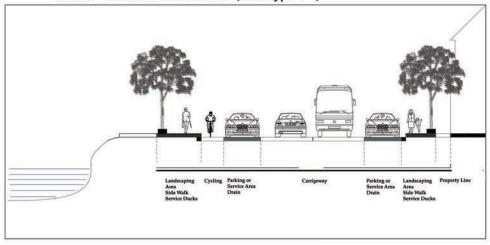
Cross section of a Level 01 – Functional Water Drive - (Road Type - 1–B)
